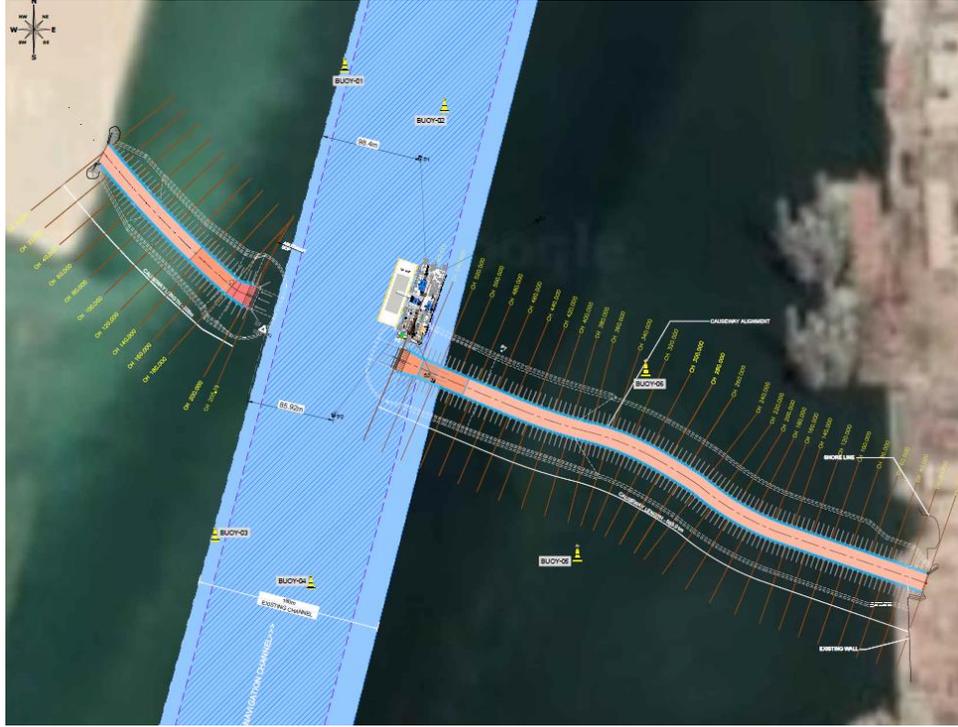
Hudayriyat Bridge Drawing – Showing the Navigation Channel Clearances & Barge Anchors Pilling Work – West Side
